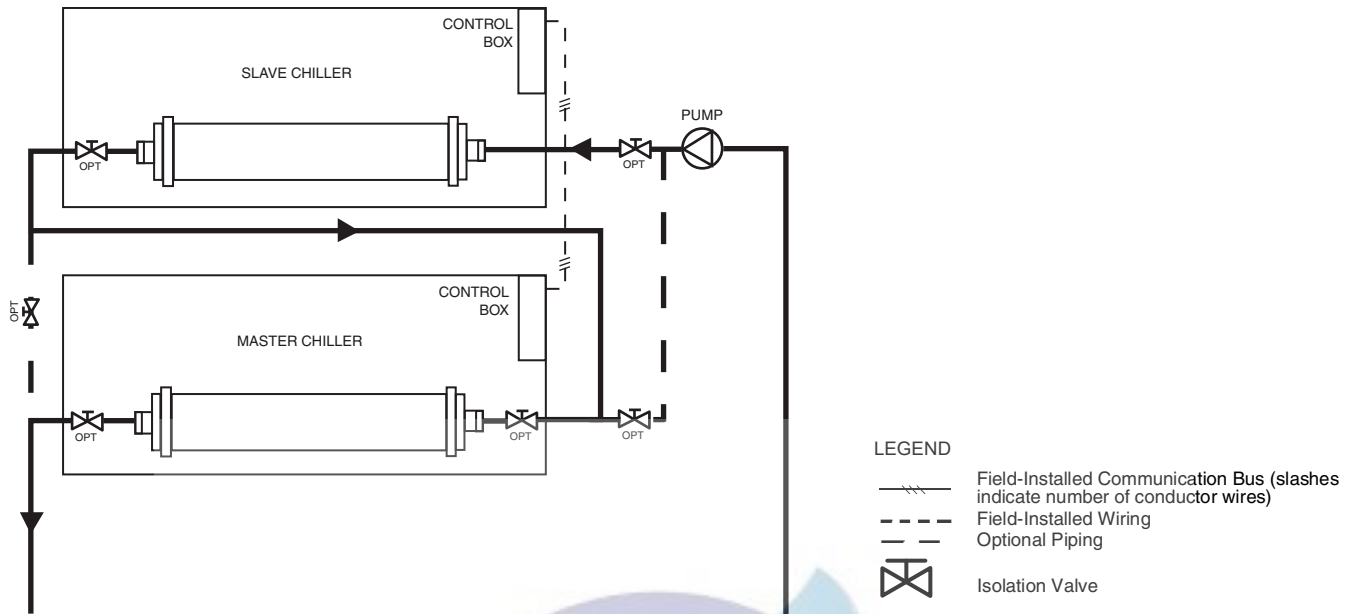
Typical Piping Diagram on 30XA Units without Hydronic Package (Flooded Cooler)
